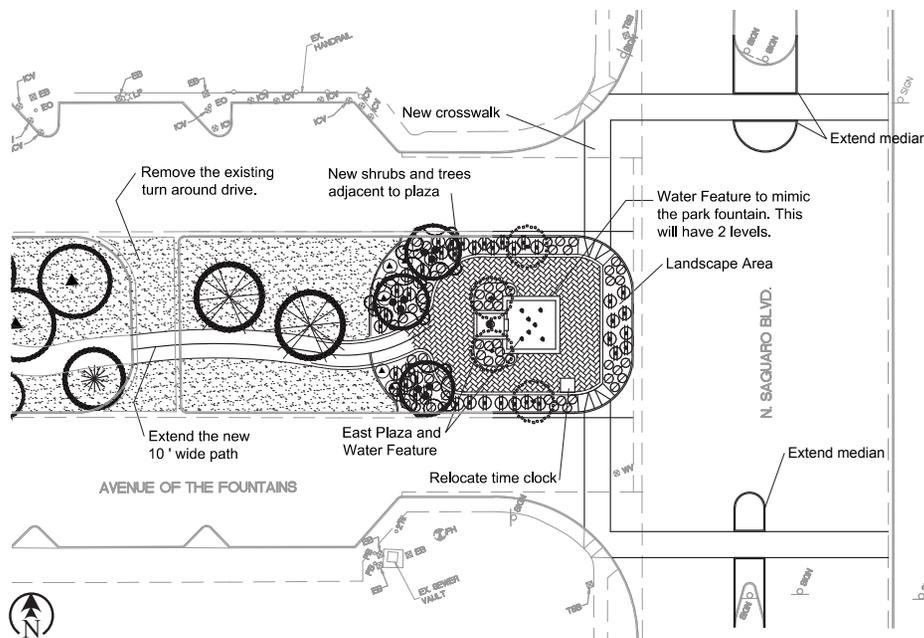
Saguaro Boulevard/Avenue of the Fountains Intersection
